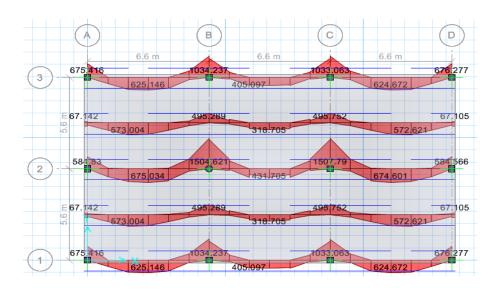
Along longer side reinforcement(SAFE:IS, without staggered column)
